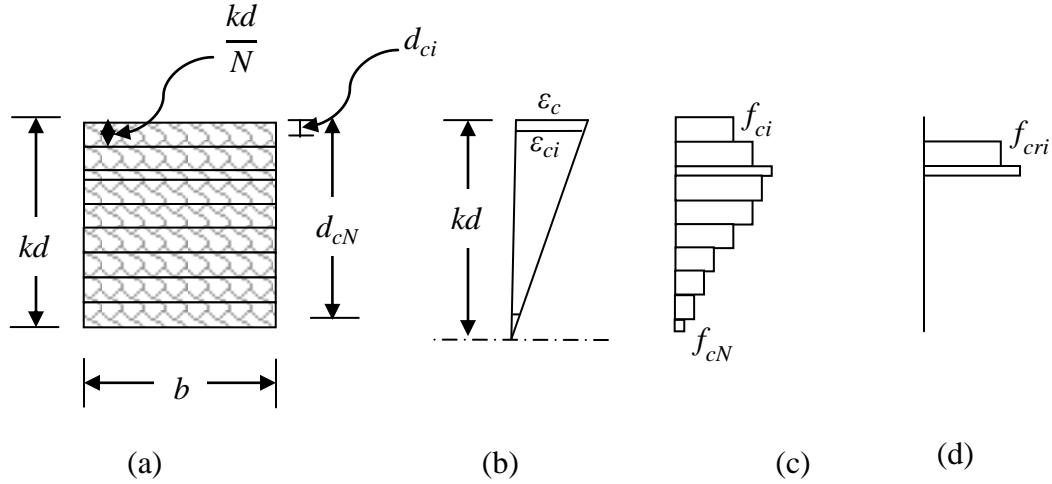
(a) Concrete compression side strips, (b) strain distribution, (c) stresses and (d) concrete stresses at reinforcement layers
